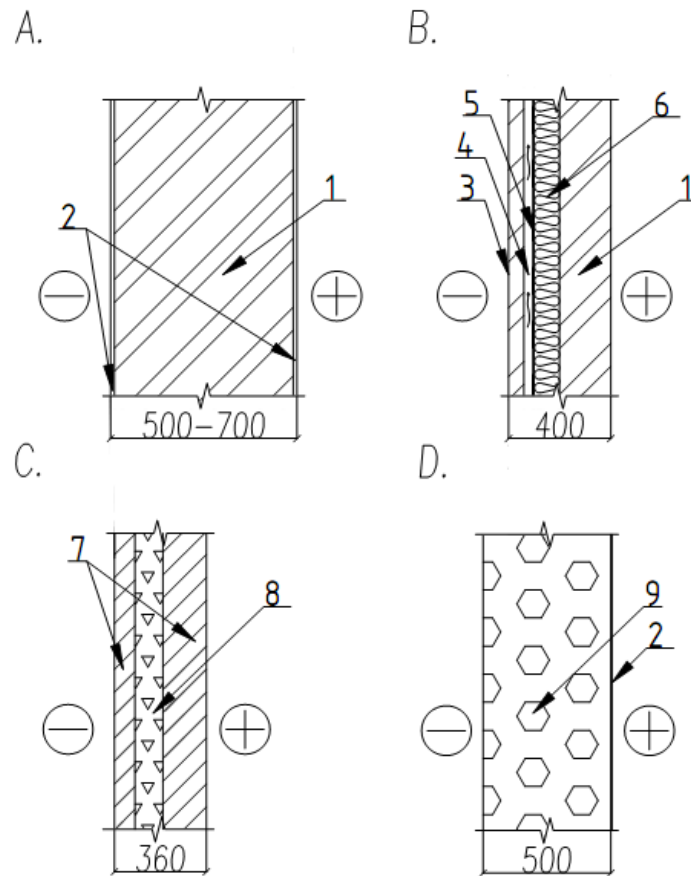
Wall sections of 4 types of buildings. A – massive masonry bearing wall; B – ventilated façade; C – concrete panel wall; D – slag-concrete massive wall. 1 – Brick masonry; 2 –plaster; 3 – façade brick; 4 – ventilation gap; 5 – water insulation layer; 6 – thermal insulation; 7 – concrete; 8 – lightweight concrete; 9 – slag-concrete.
